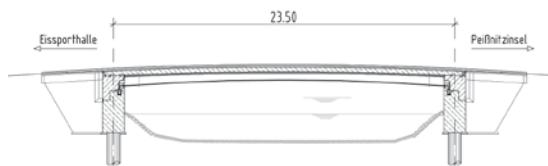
, Longitudinal section of Bridge over Wilde Saale (Saale loop) in Halle (D)
